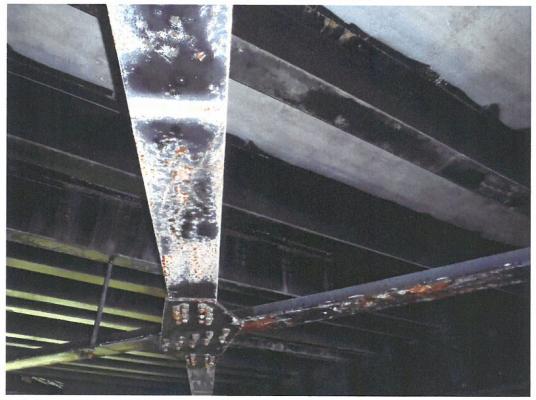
General distress to the underside of the superstructure lift span, typical
